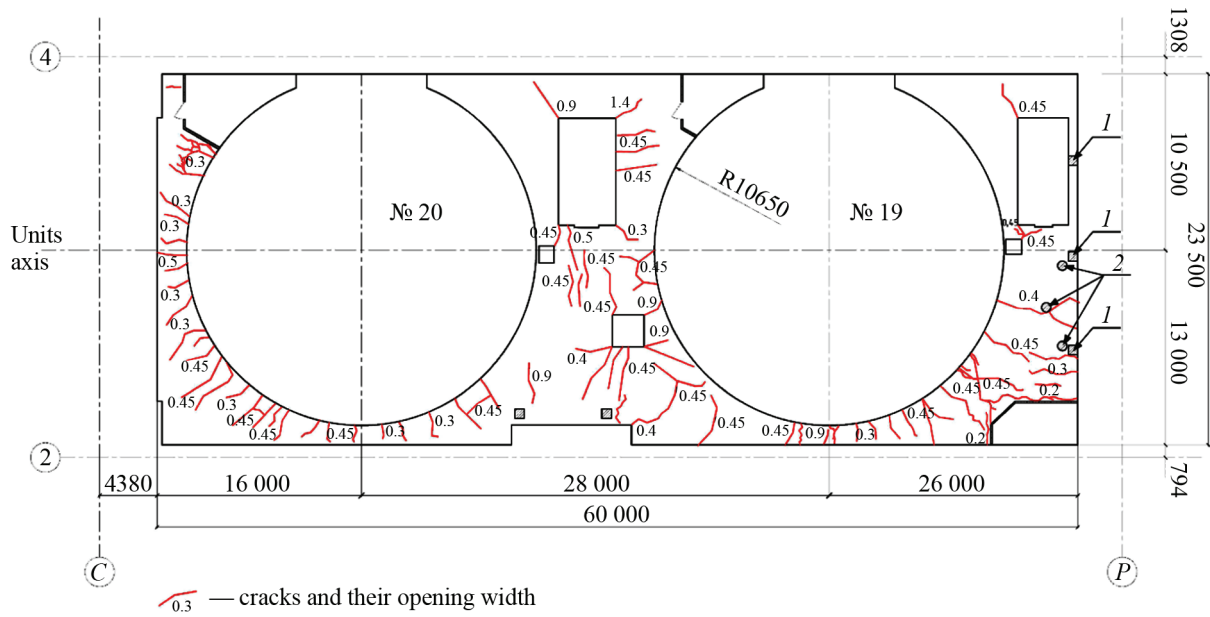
The layout of the cracks in the overlap of the machine hall floor. 41.3 m, lower bound (section number 10): 1 — project columns; 2 — additional steel supports
